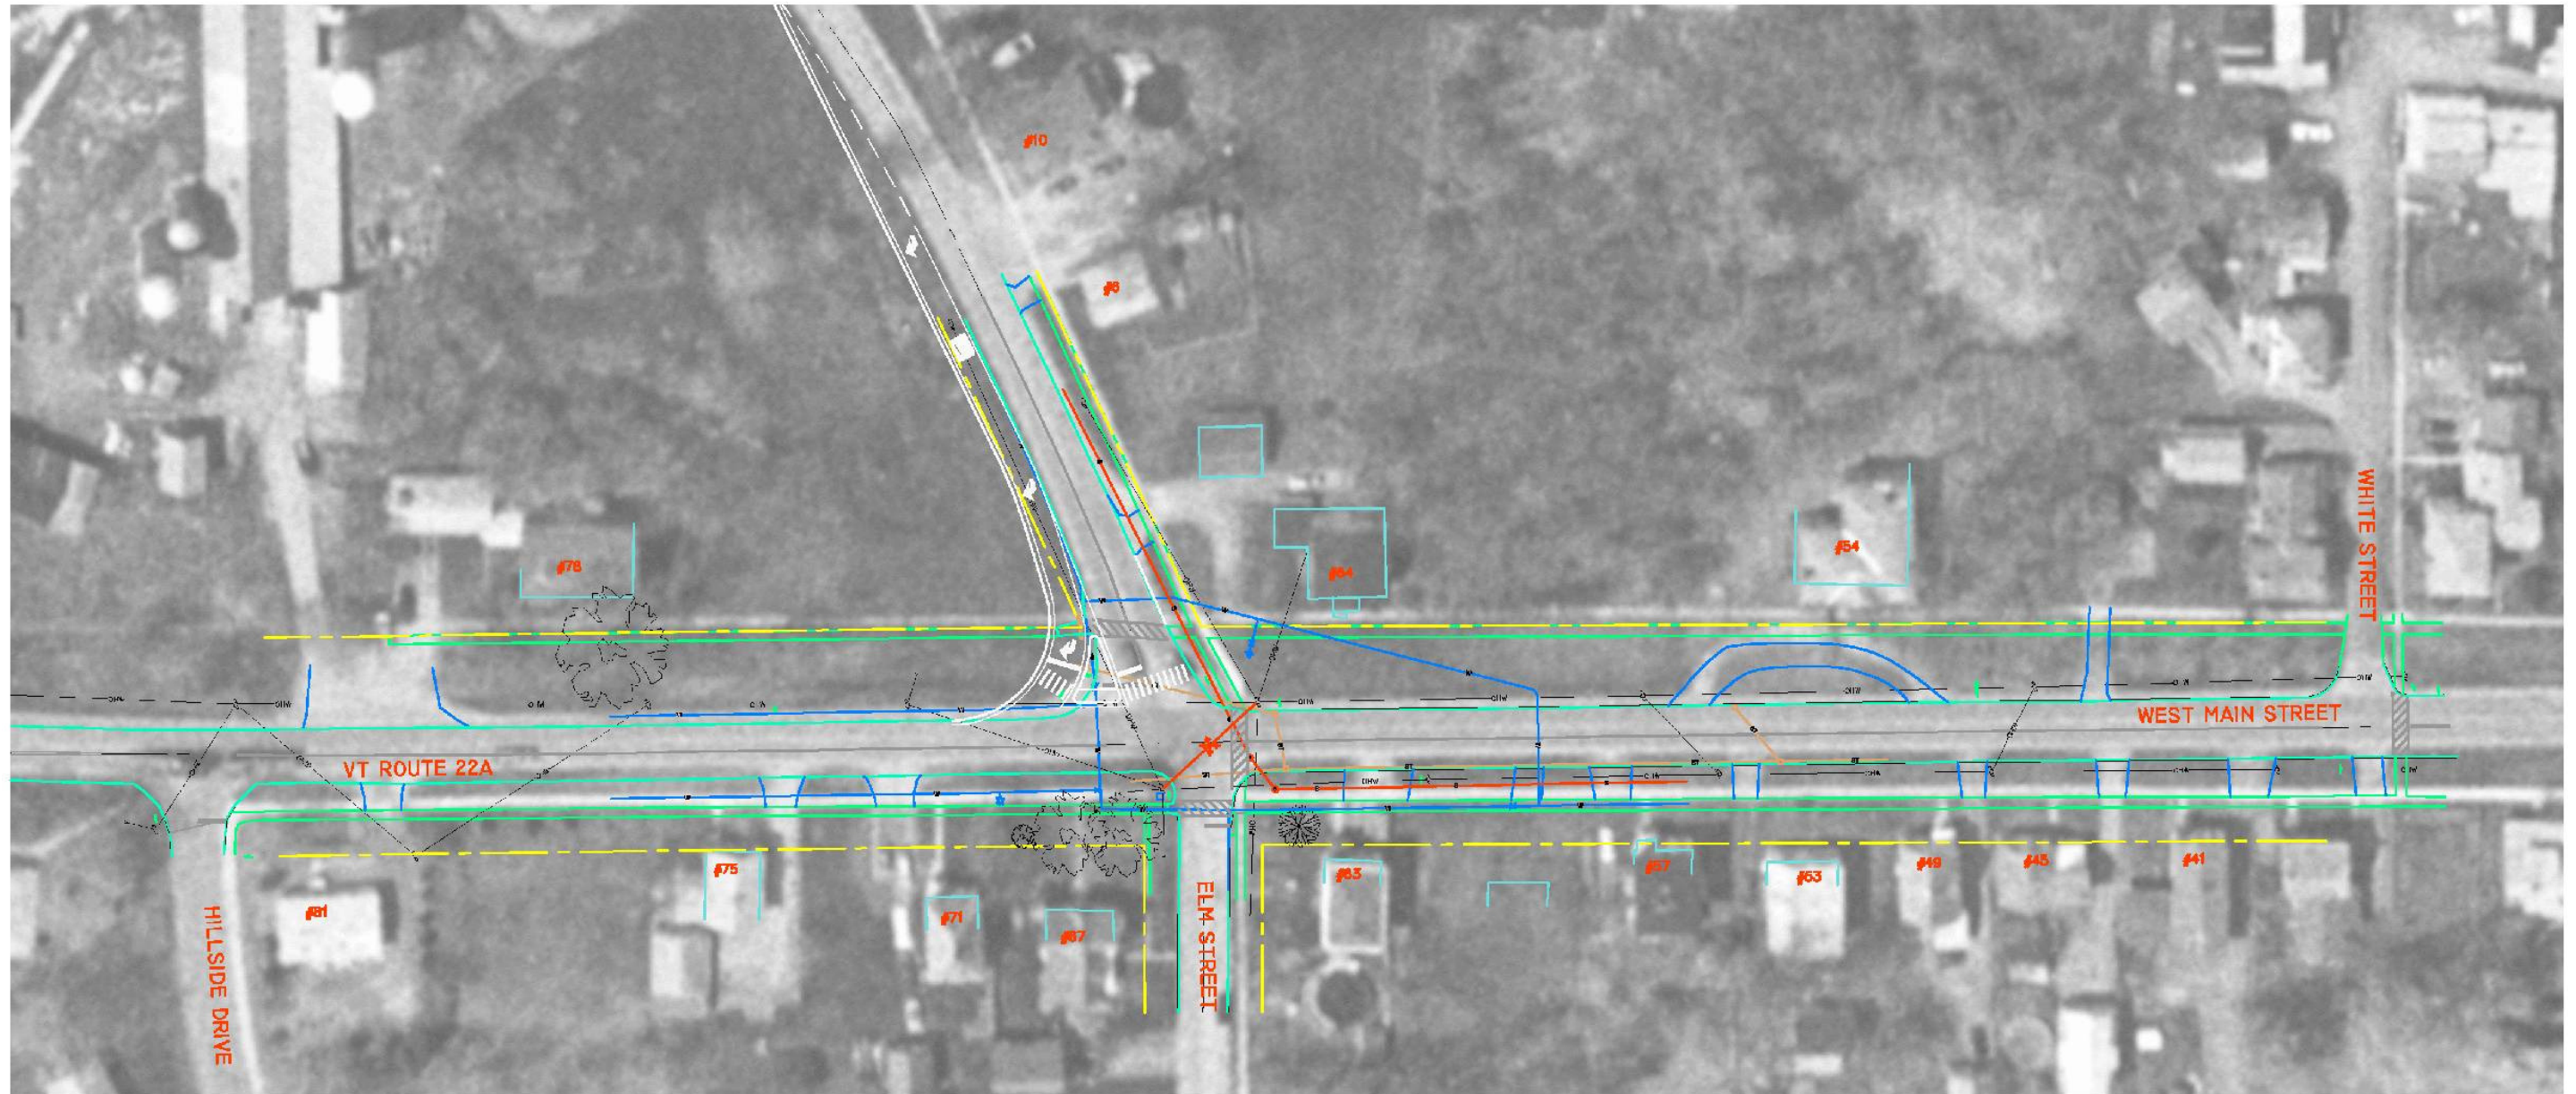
Alternative C2 – Two-Way Stop Control w/ Route 22A and Pantan Road Widening
